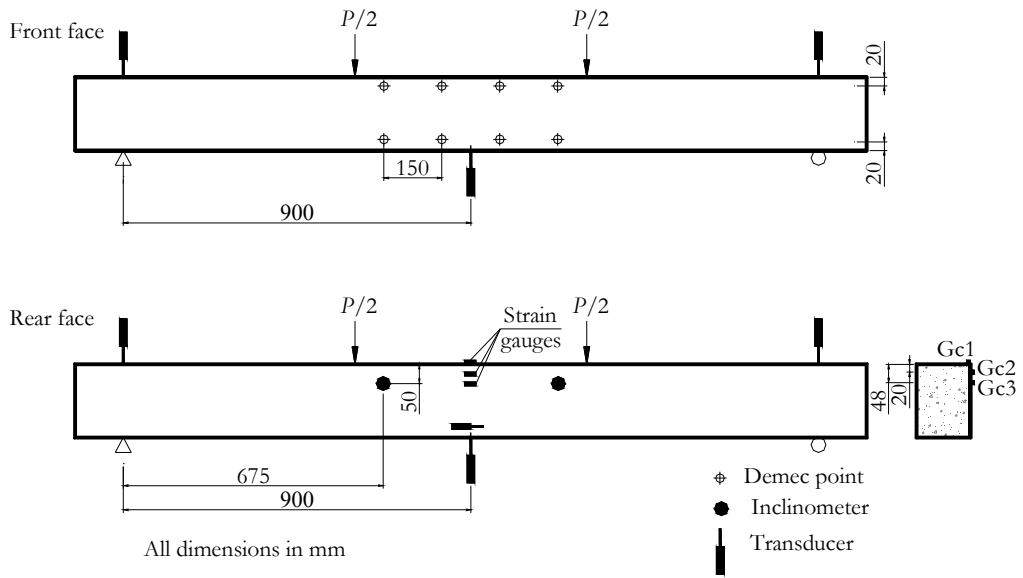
Instrumentation details for beam C2-212-D2-B.
